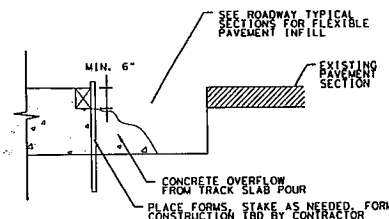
TRACK SLAB ADJ. TO EX. CONC. PAVING
